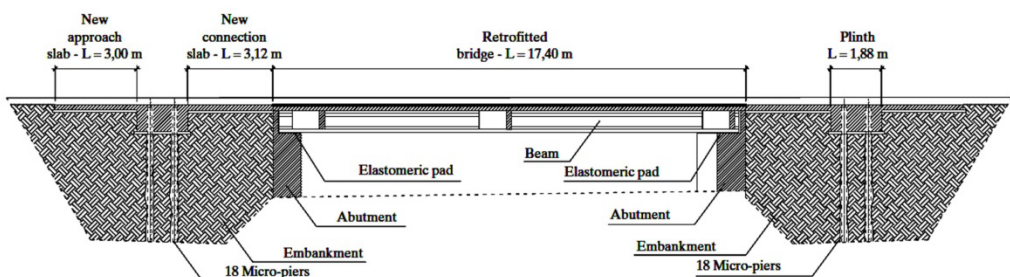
Elevation layout of 'Treviso Bridge' after retrofitting (Russo et al., 2009)
